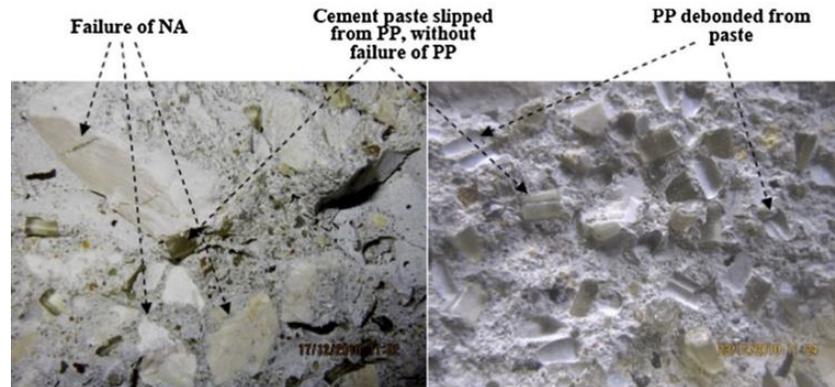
Photo of the concrete specimen after failure in the tensile splitting test [48]
